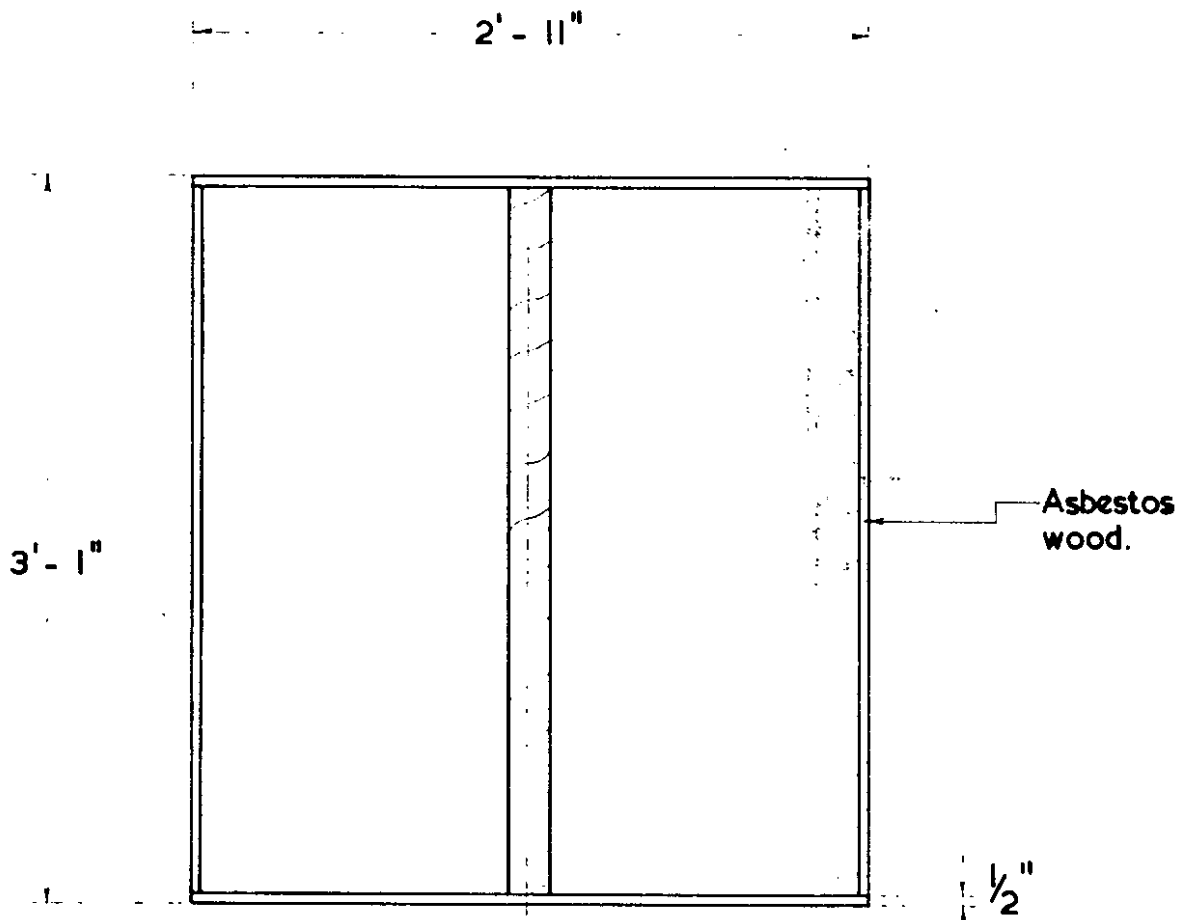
UNDERSIDE OF SPECIMEN WITH FRAMING.
